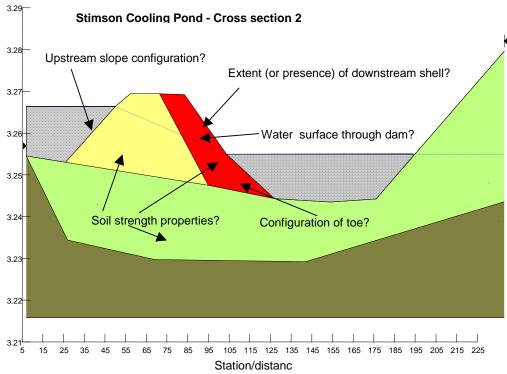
Conceptual model of cooling pond embankment at cross section #2 (soil embankment) highlighting the missing information necessary to adequately quantify stability
